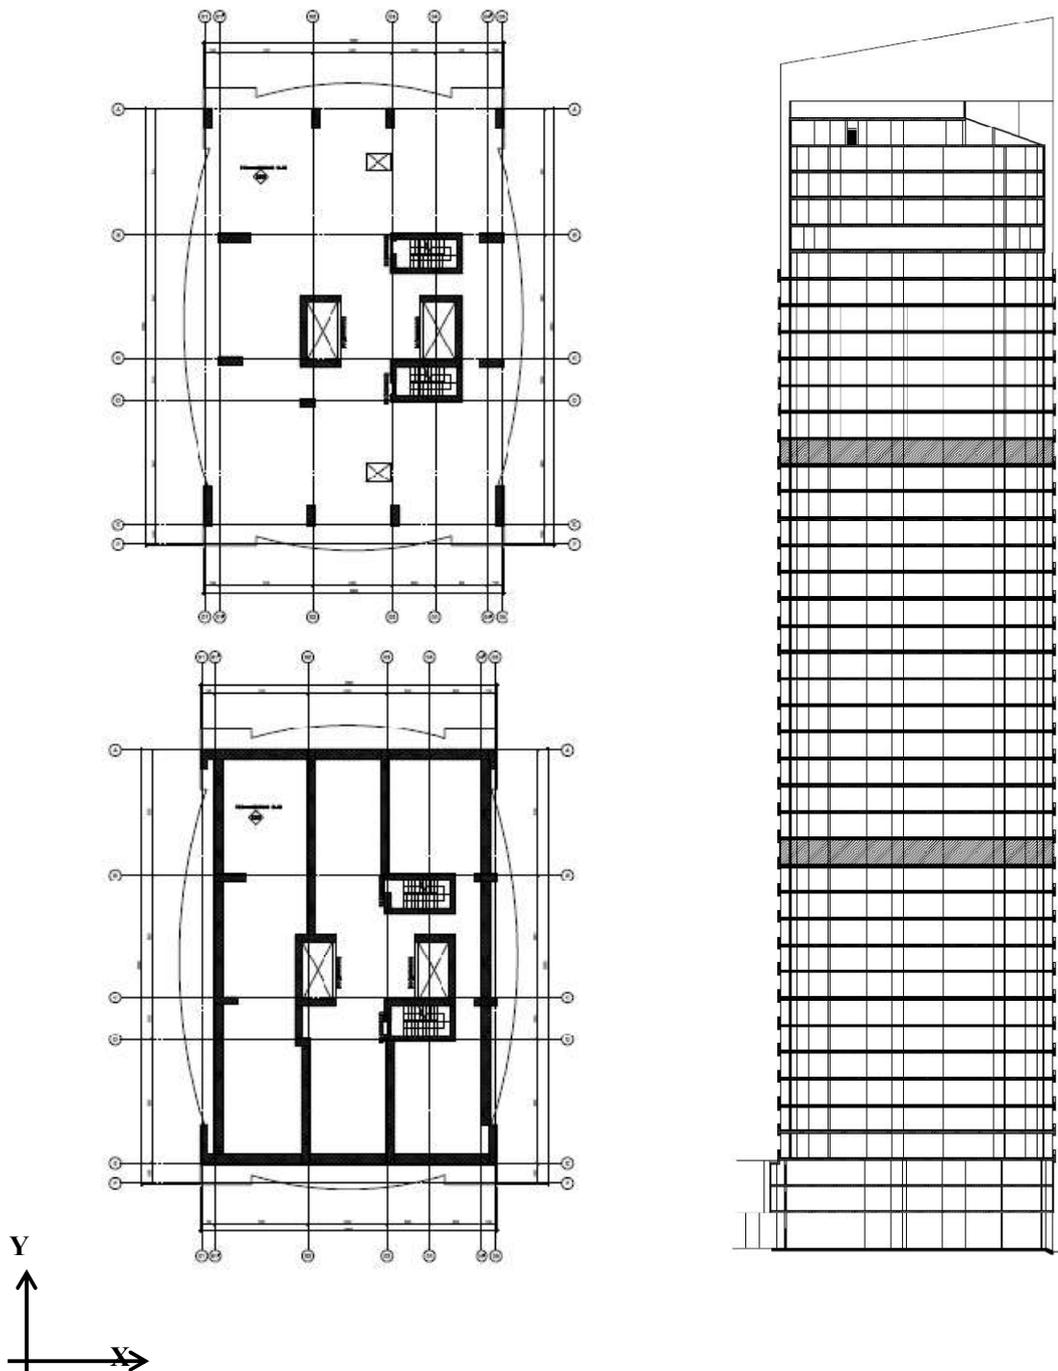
Structural System for Case Study (2) of Shear Wall with Outriggers.
